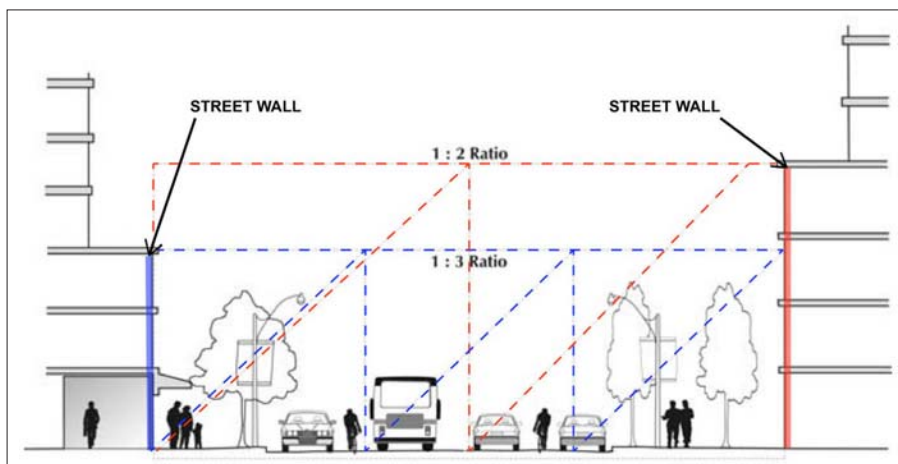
A building height-to-street-width ratio of between approximately 1:3 and 1:2 is recommended to frame streets and provide human scale. Portions of buildings above the street wall are encouraged to step back.
